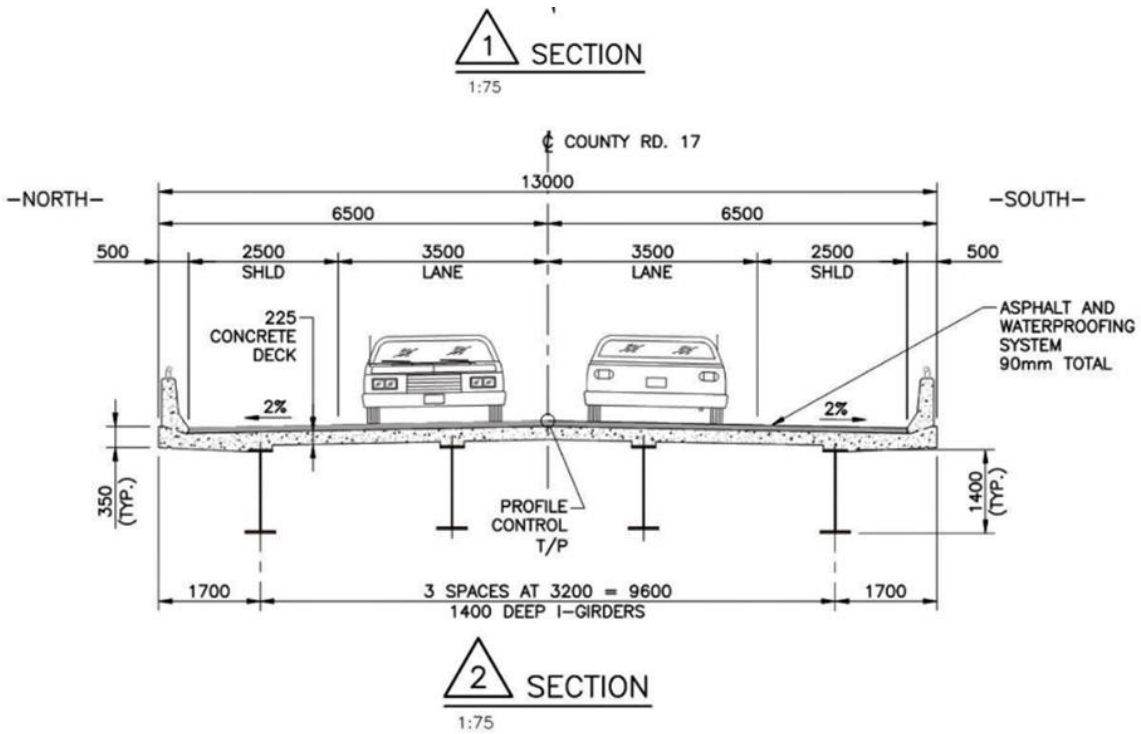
Illustration of County Road 17 Underpass (Site No. 27X-0051/B0) Cross-Section
